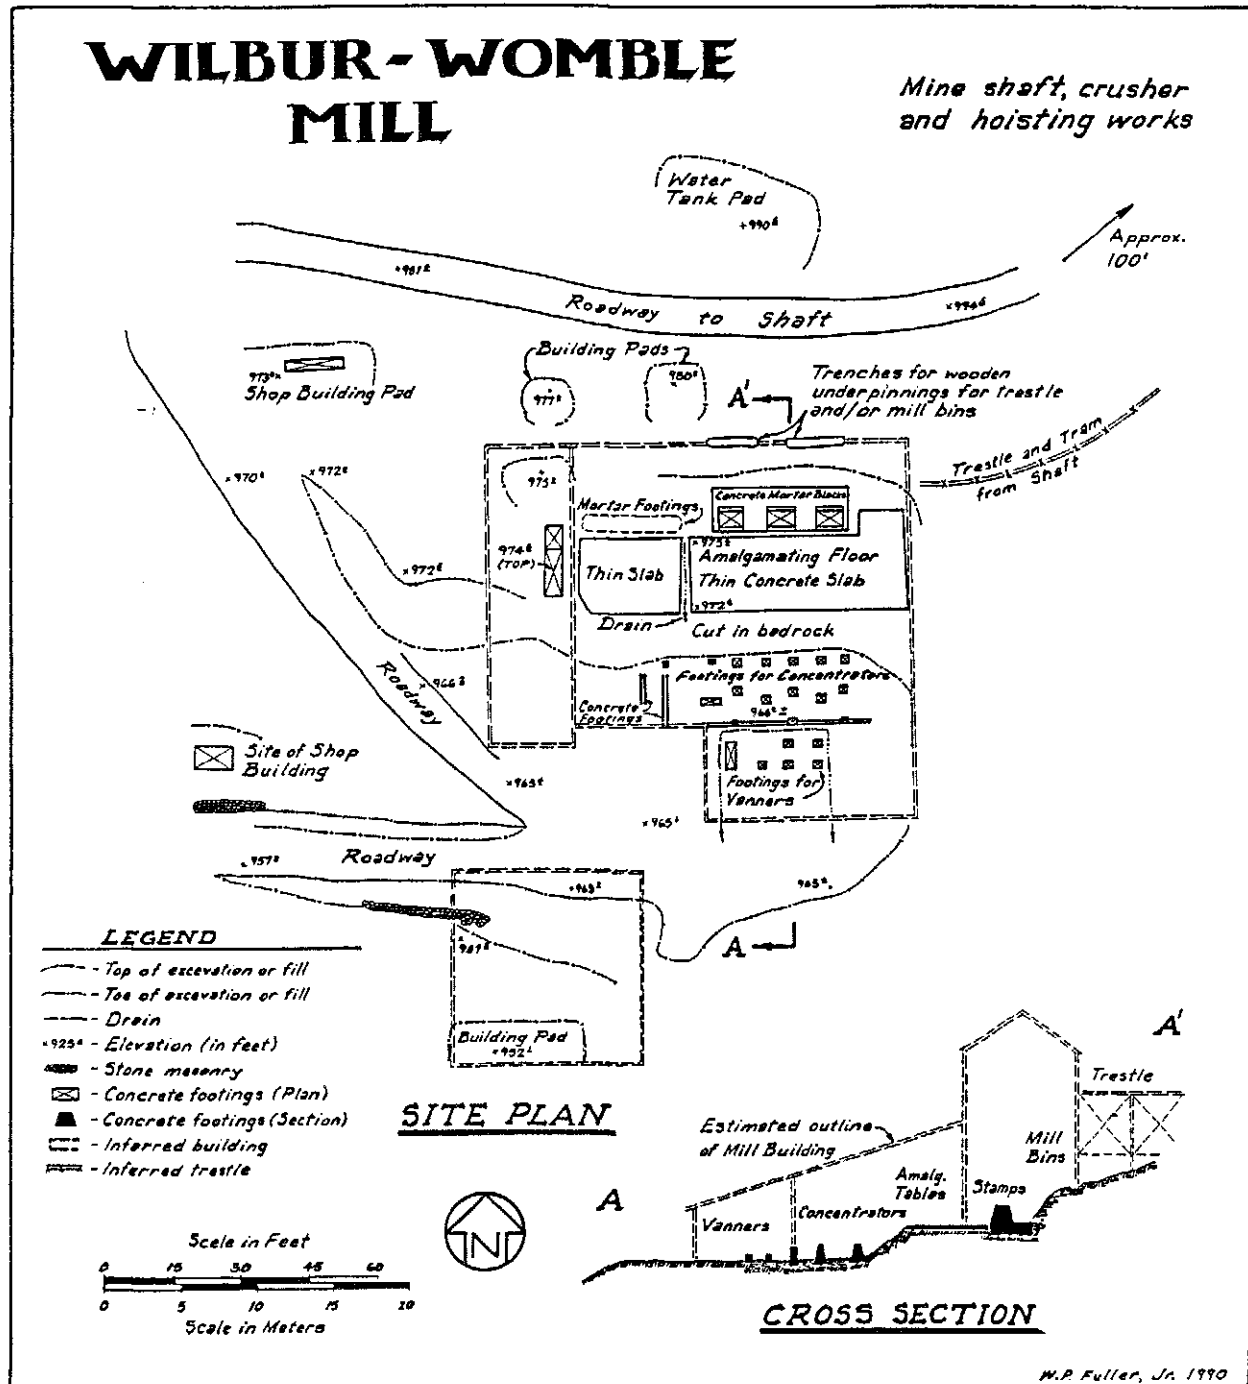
Site plan and cross section of the Wilbur-Womble mill.
